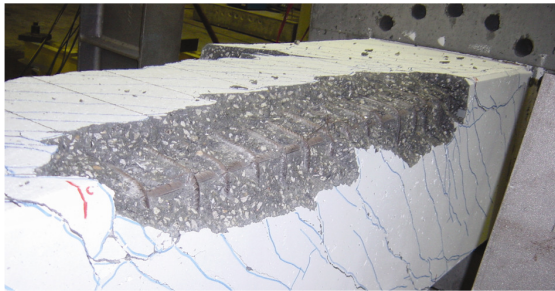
Fragile failure due to corner break off: Beam E-1.33-1.0-0
